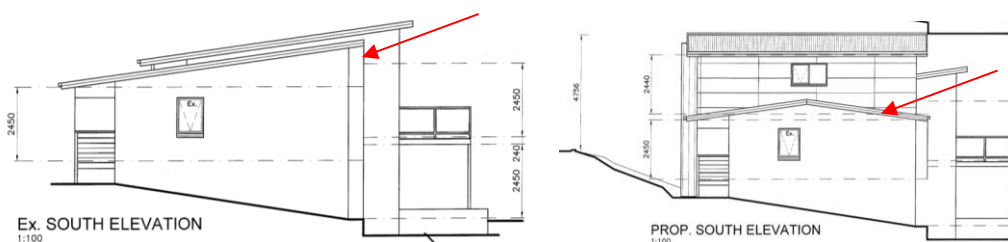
Existing and proposed roof design along southern elevation (arrow)
